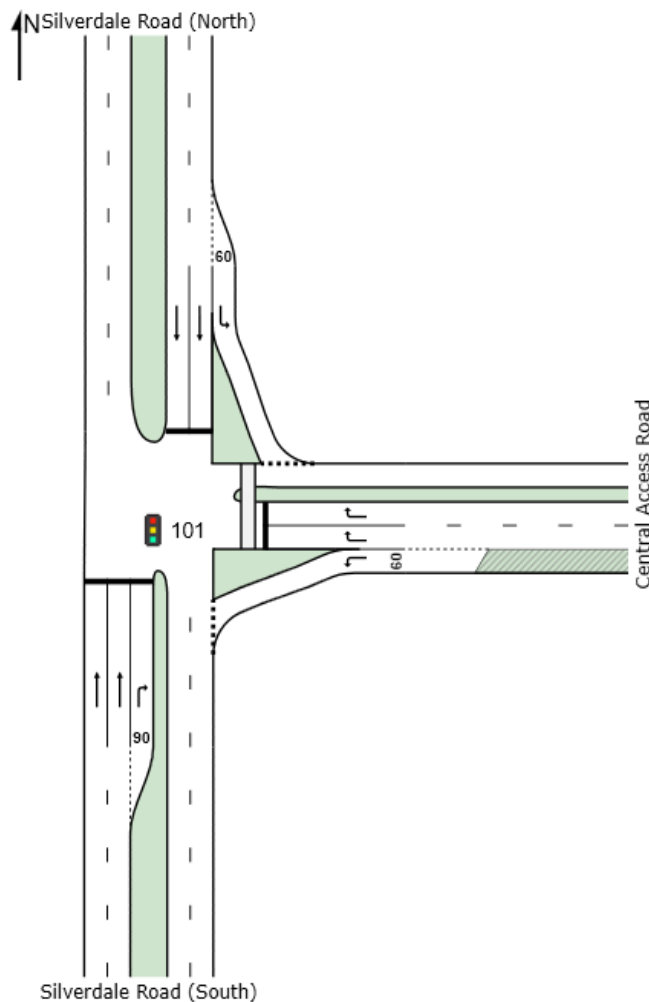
Silverdale Road / Central Access Road Intersection Geometric Layout
